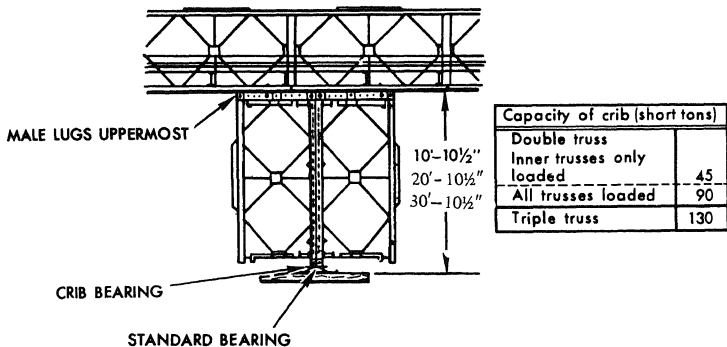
Single- to triple-story double-bay with panels vertical. Continuous bridge with rocker bearing at base of crib.
